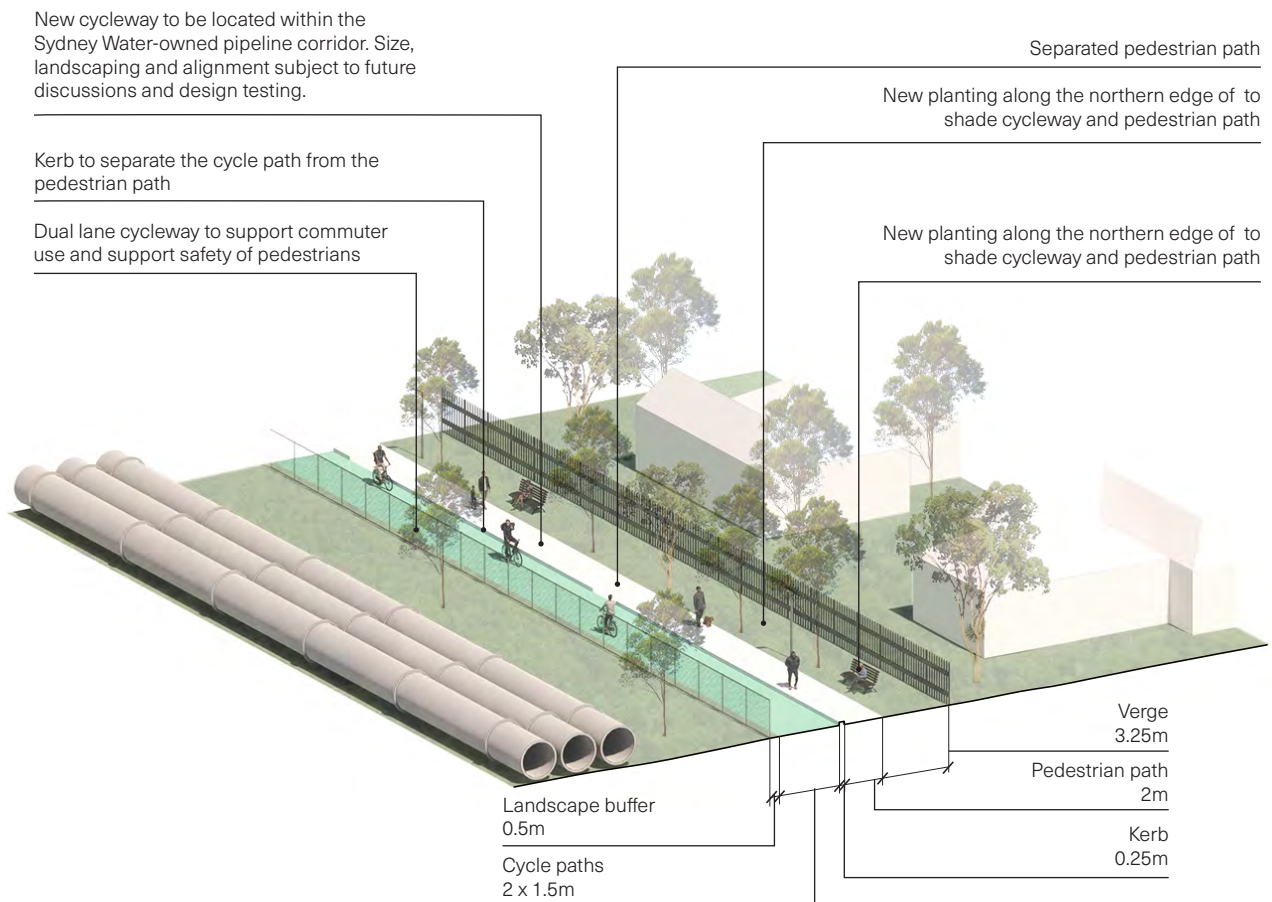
Indicative section - Proposed cycleway adjacent to existing development
